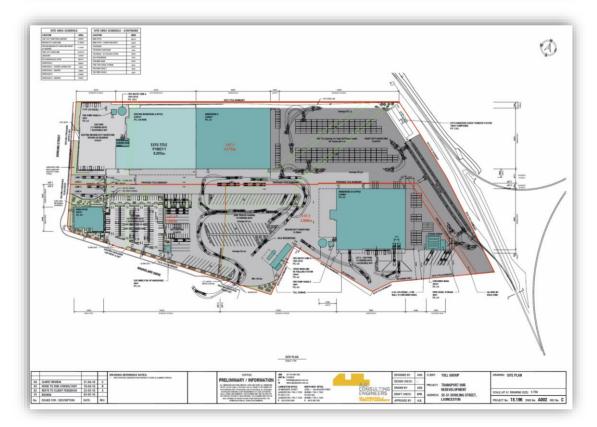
Existing and proposed site plan (supplied by AJL Consulting Engineers).
